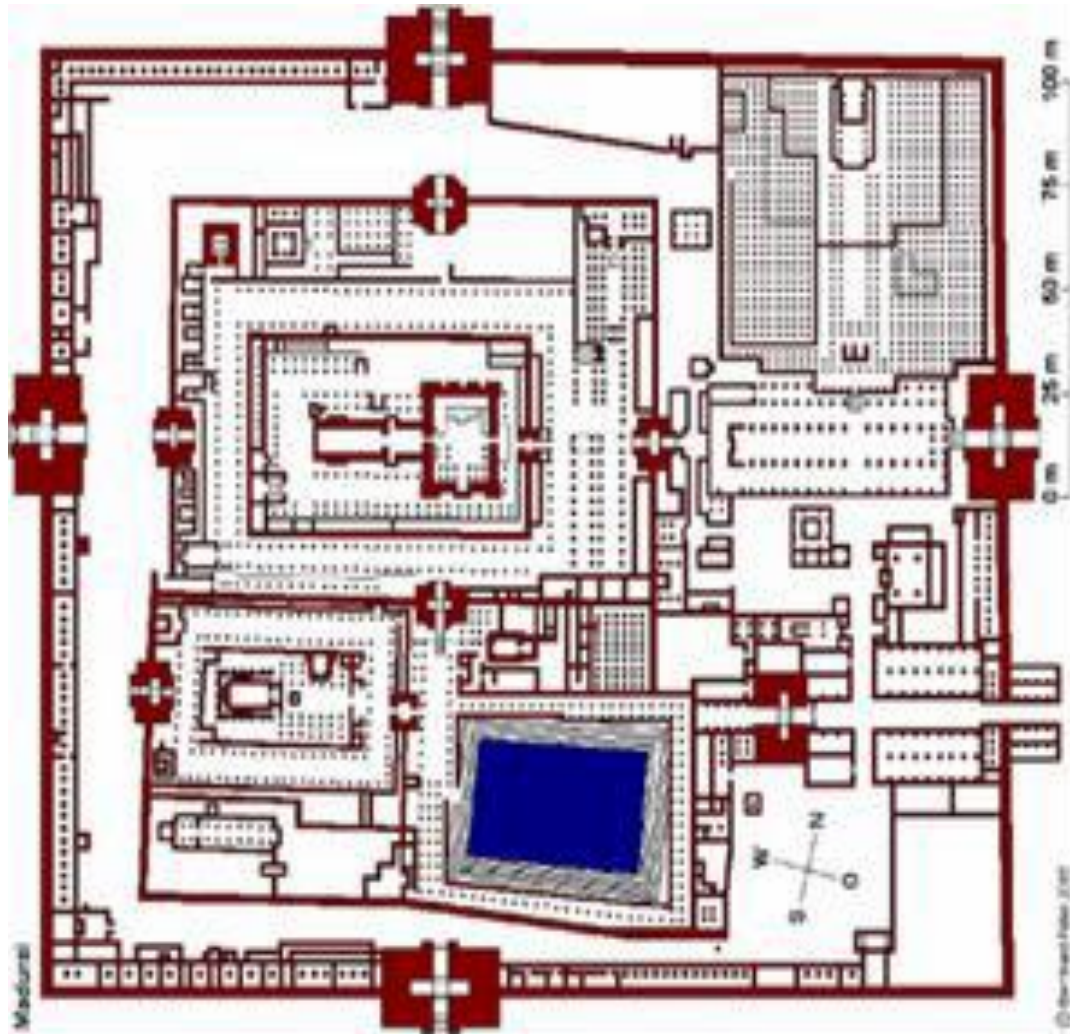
Plan of a typical Dravida style Temple as depicted by the plan of Meenakshi Temple
